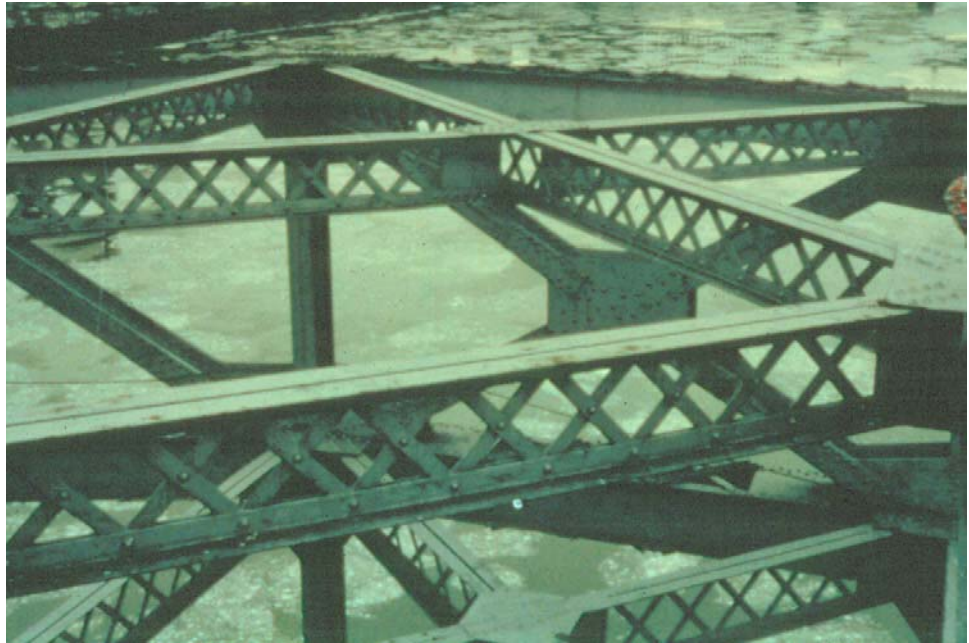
Bracing Members Made from Angles, Bars, and Plates
